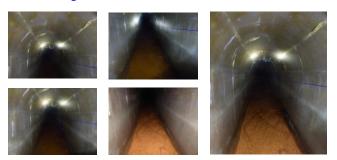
Flood culvert 3D panoramic image of tailings dam drainage tunnel
